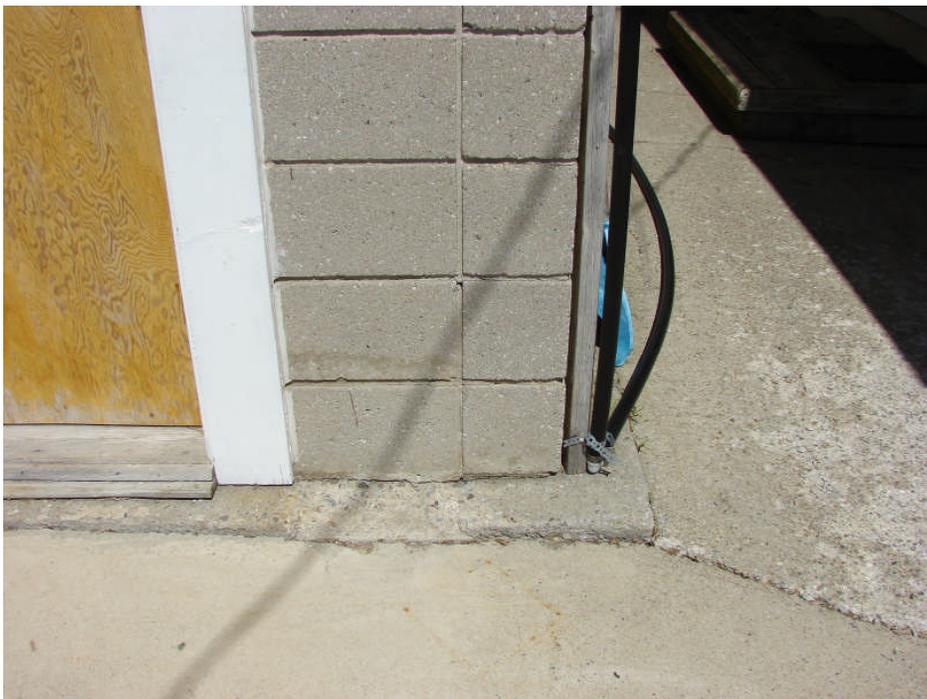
Garage Building south elevation – concrete slab-on-grade cracking at east overhead door, typical.
